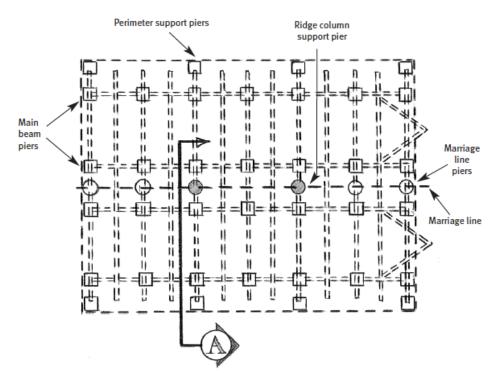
Pier and Anchor Foundation Components (MHRA, 2002)
